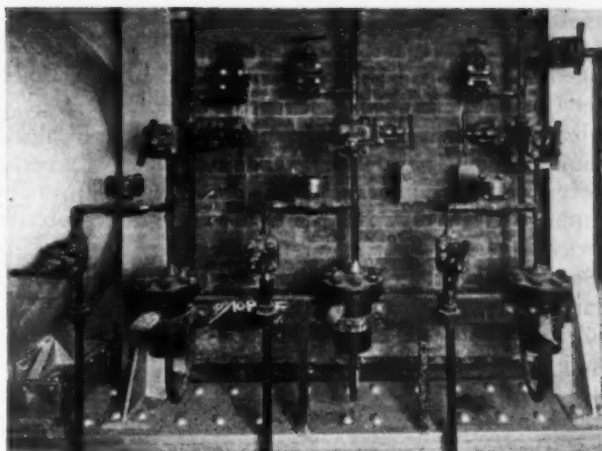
Trap installation showing socket-welding fittings and valves as typical for small joints
